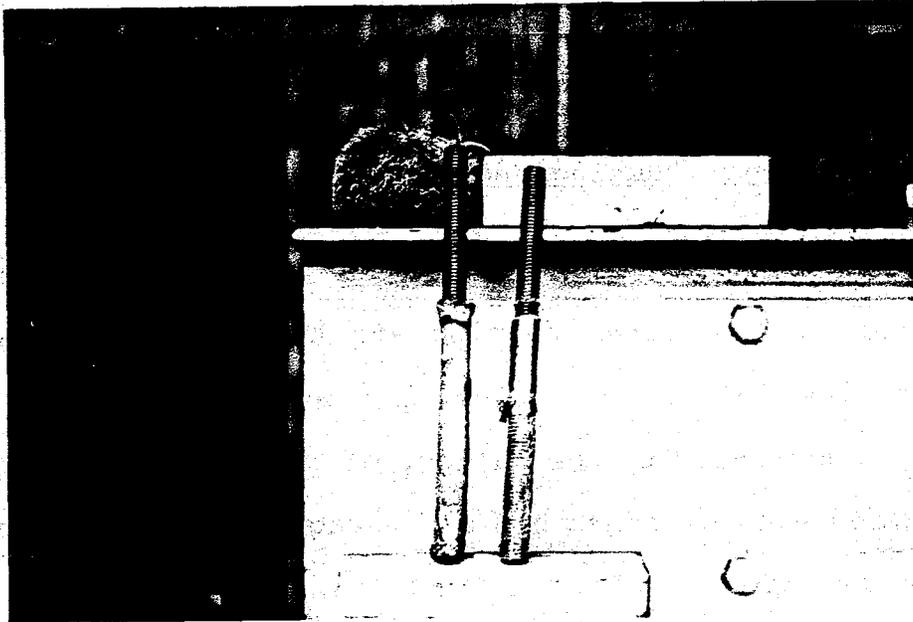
Fully-bonded (left) and partially-bonded (right) anchors subject to confined testing
